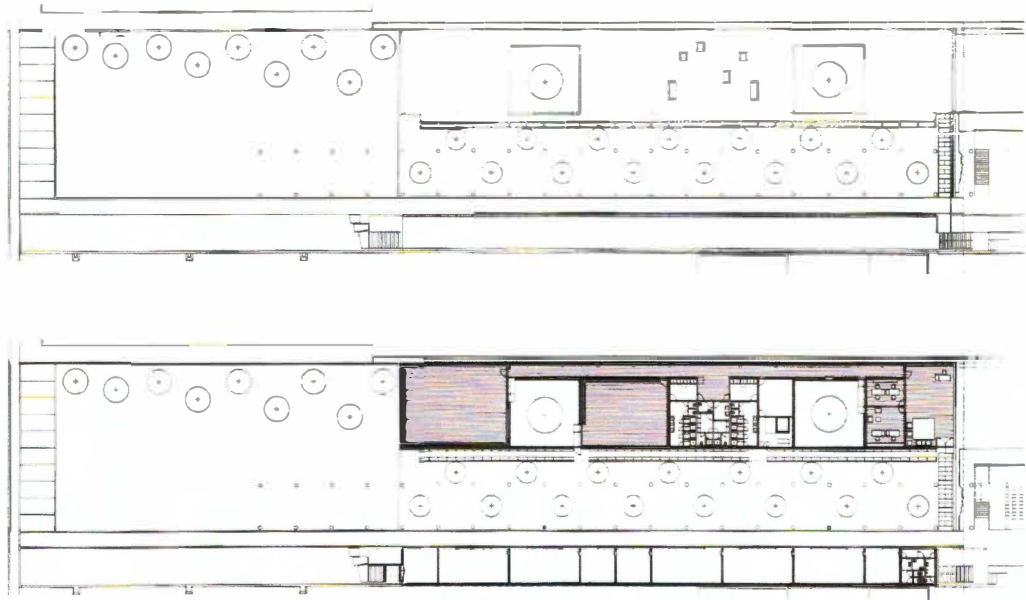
B-1 Municipal Market Roof Plan (above) and Ground Floor Plan (below)
